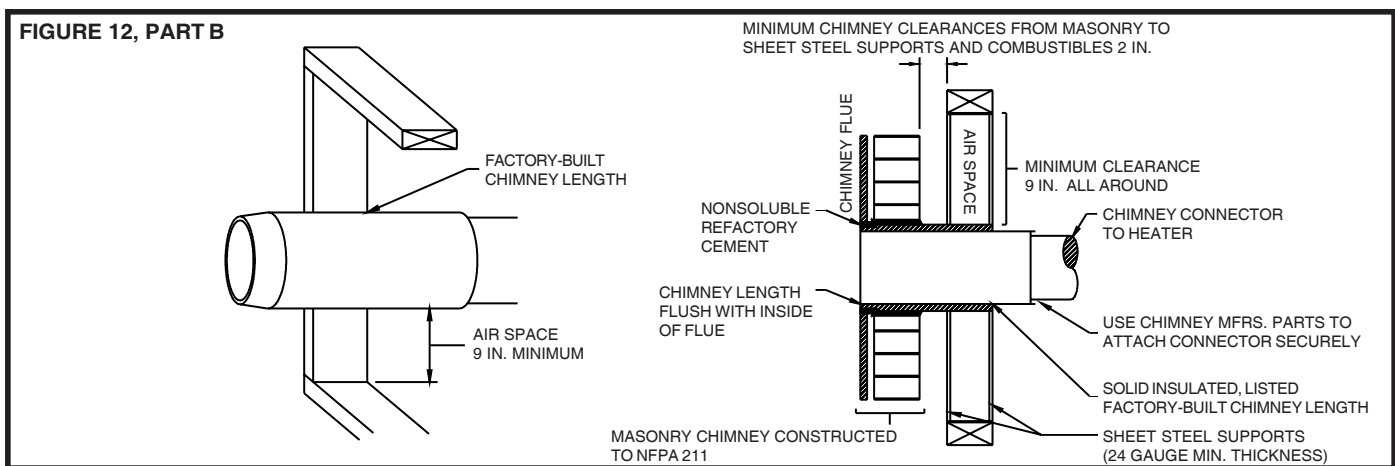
shows how to connect the chimney connector of a heater to a masonry chimney through a combustible wall.
